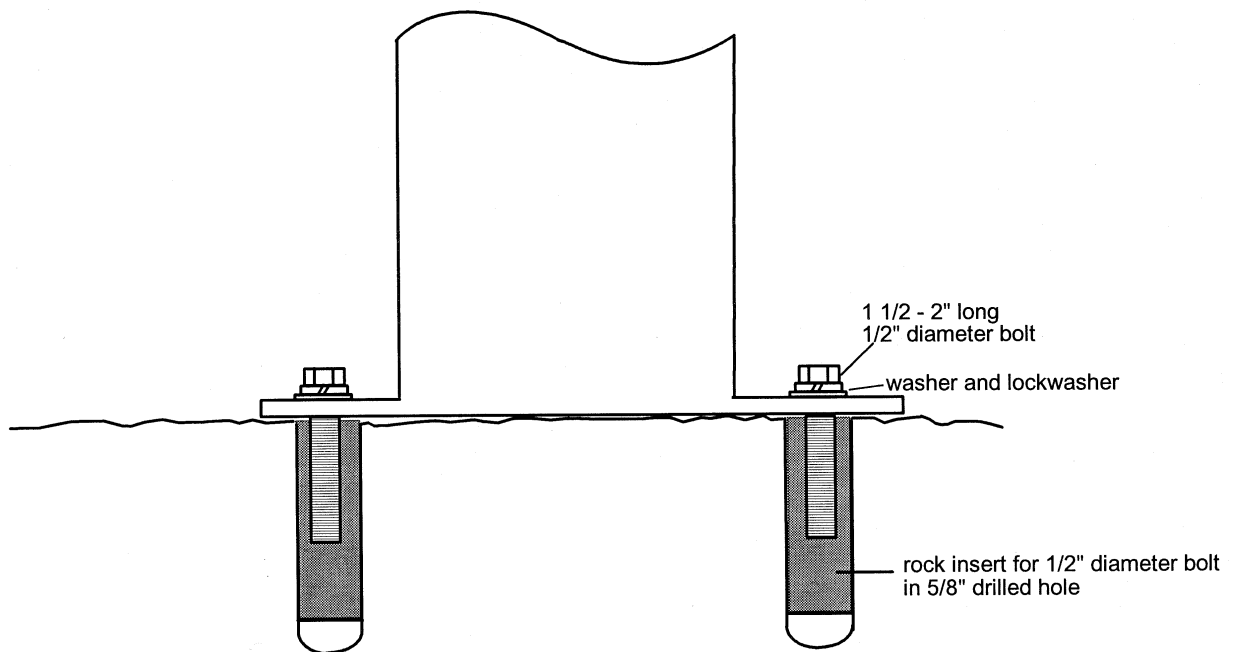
Mounting Post Configuration on Pre-Existing Concrete/Rock Surface.
